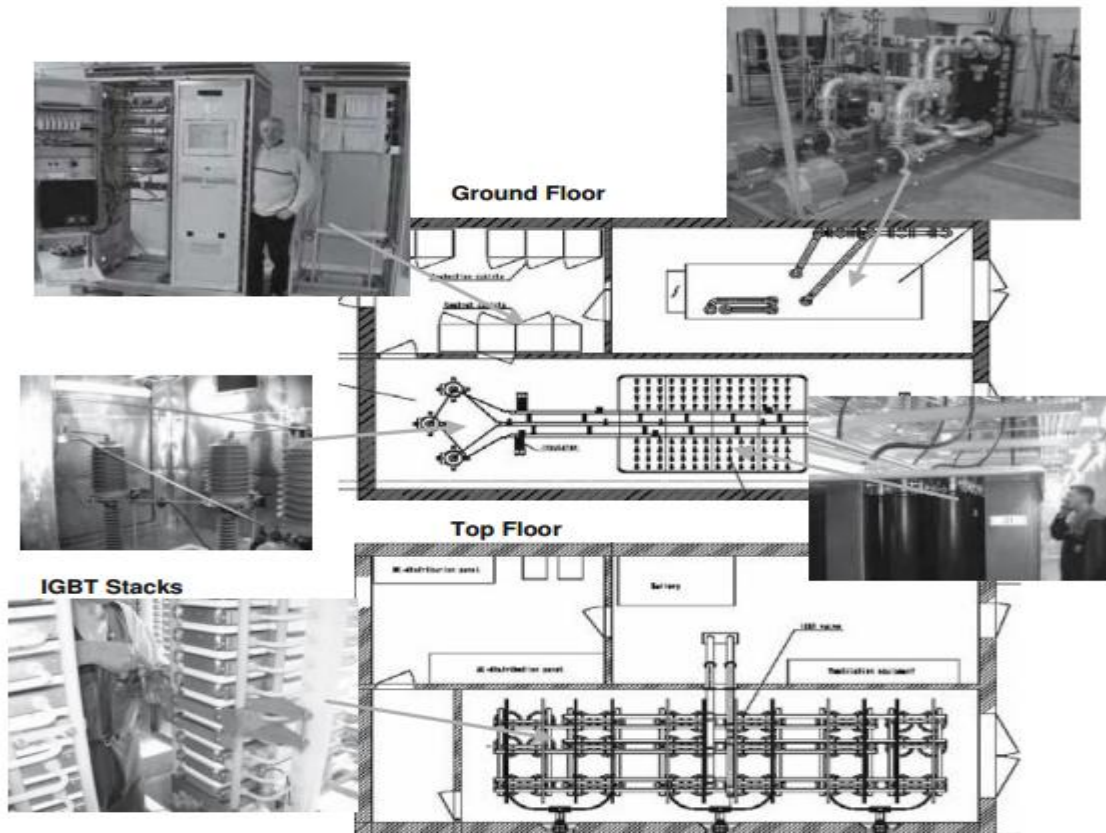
Typical layout of a STATCOM-building (Source: ABB) [19]
